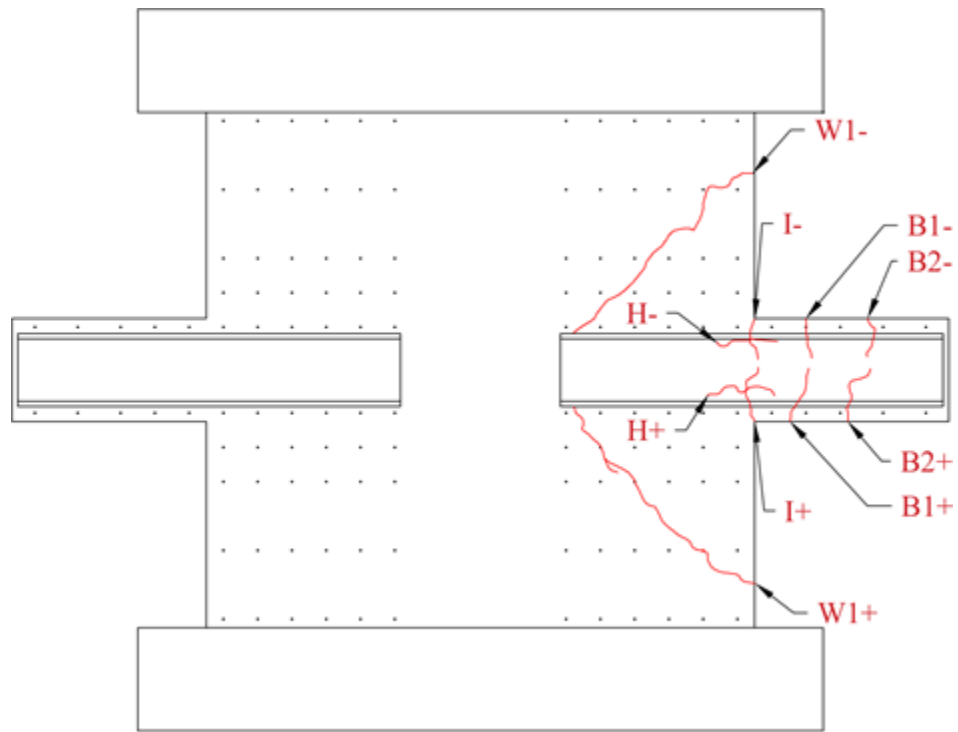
Location of Cracks 0.2 Millimeters or Larger for SRC-W2
